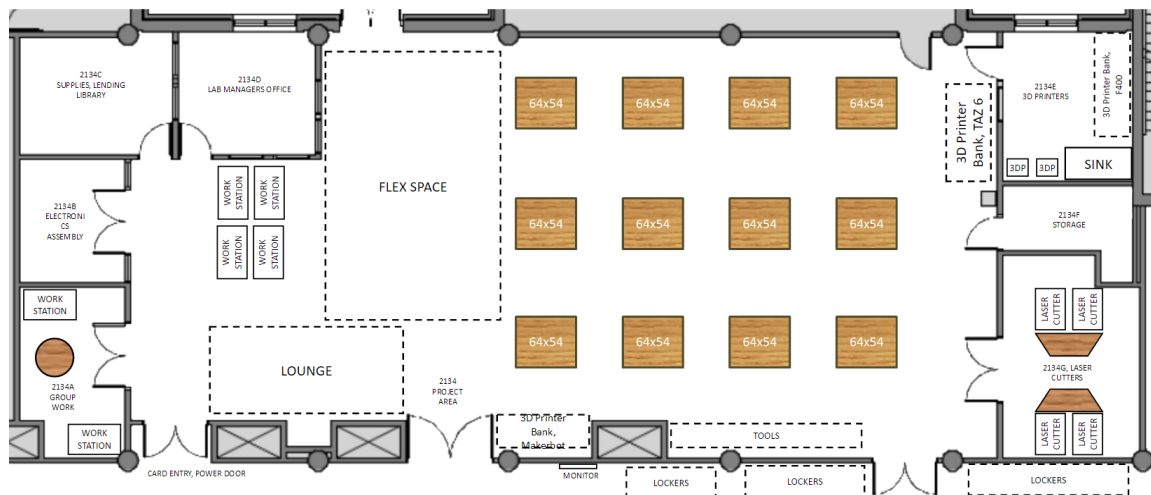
The Student Design Lab floor plan (courtesy of Ben Guengerich).
